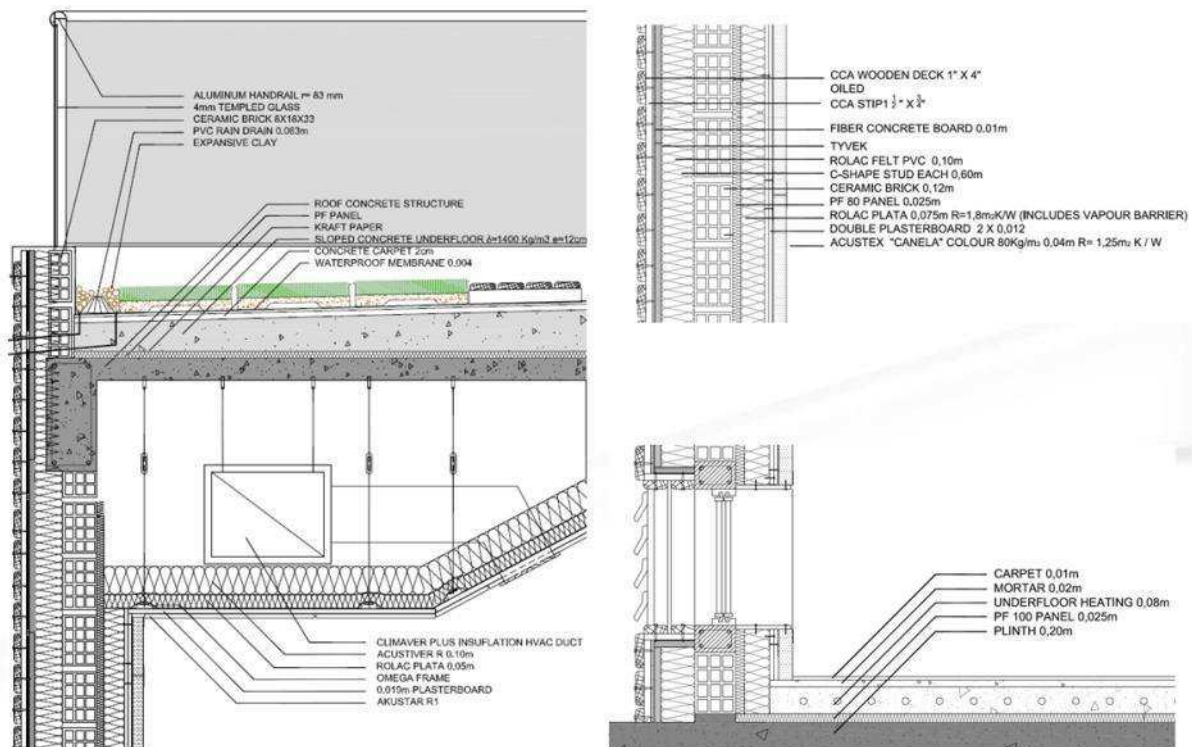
"Wall and roof construction details at western administrative sector". Source: the authors
